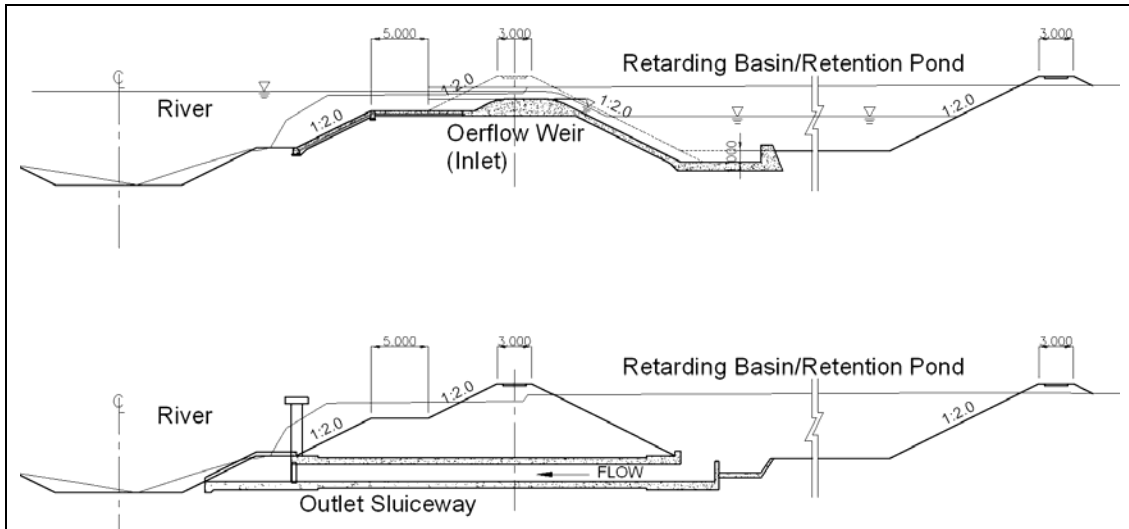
Typical Cross Sections of Inlet and Outlet of Off-Site Flood Mitigation Facilities
